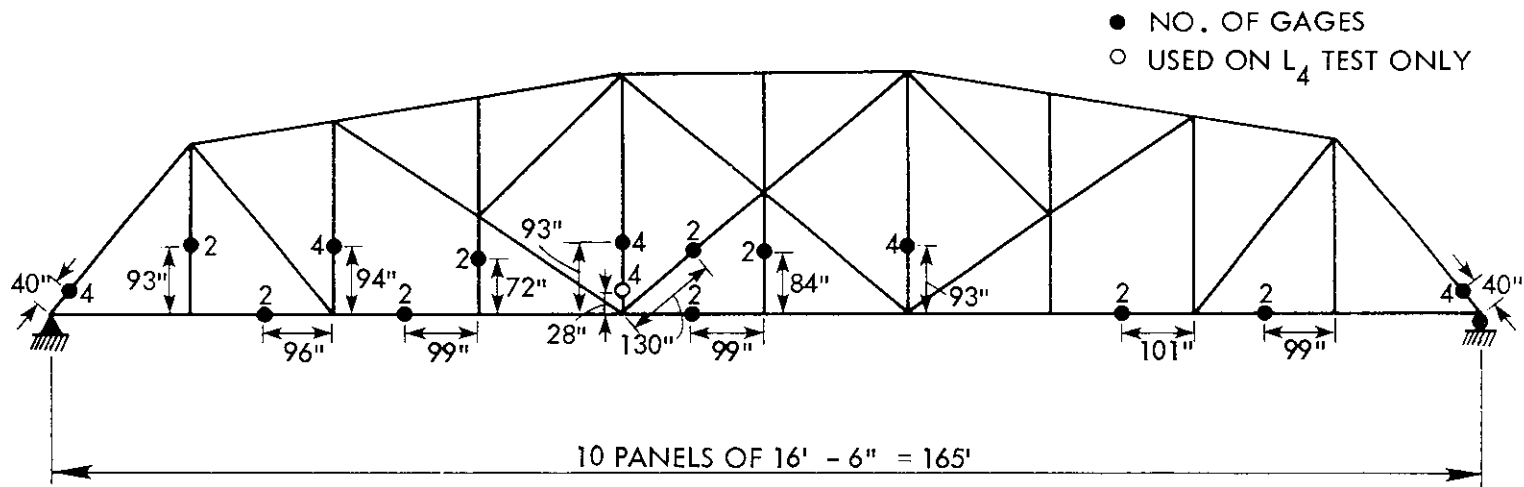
Location of strain gages of span 1 (floorbeam test).
